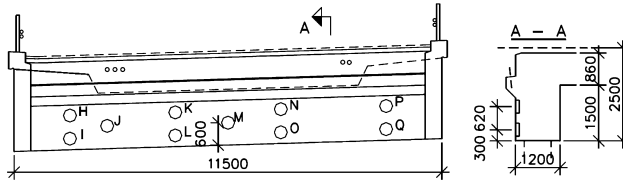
Earth-pressure cells, labeled H–Q, at the eastern bridge abutment (T4; dimensions in mm)
